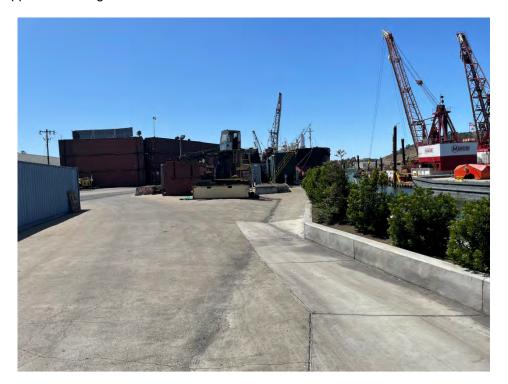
Looking south toward TS-2 (SW-5 area), no significant cracks or deterioration noted in the area.
